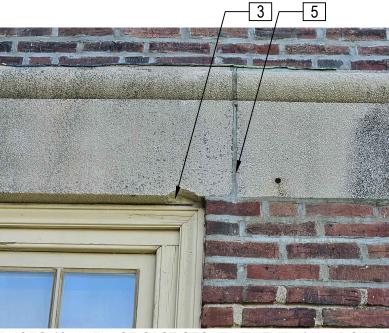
VIEW OF CAST STONE AT LEVEL 1 WINDOW HEAD
